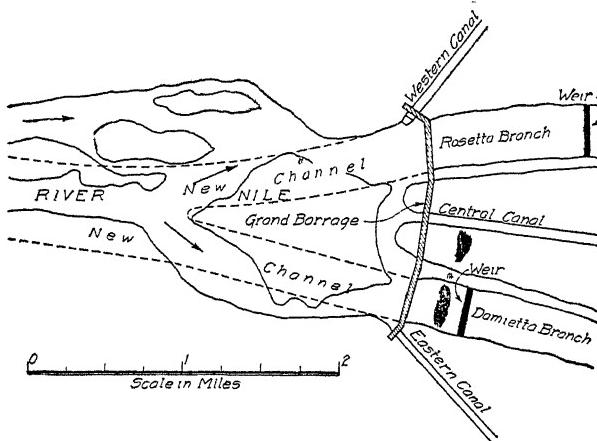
Plan of Grand Barrage over Nile River Showing Also Location of Damietta and Rosetta Weirs
